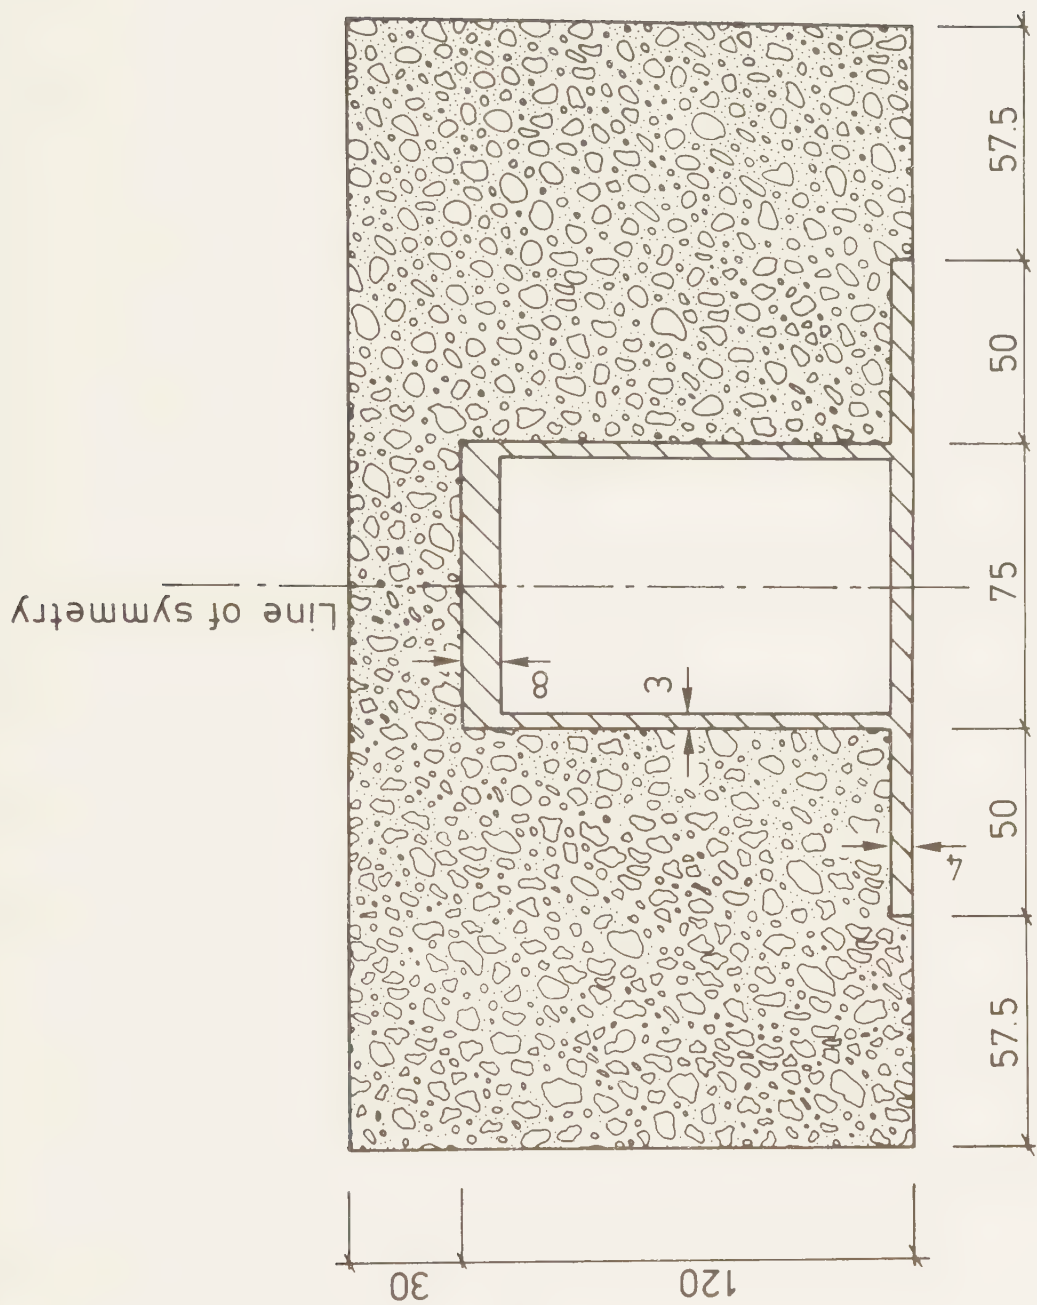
Box girder embedded in a concrete slab. The vertical concrete sides were insulated during furnace test.
